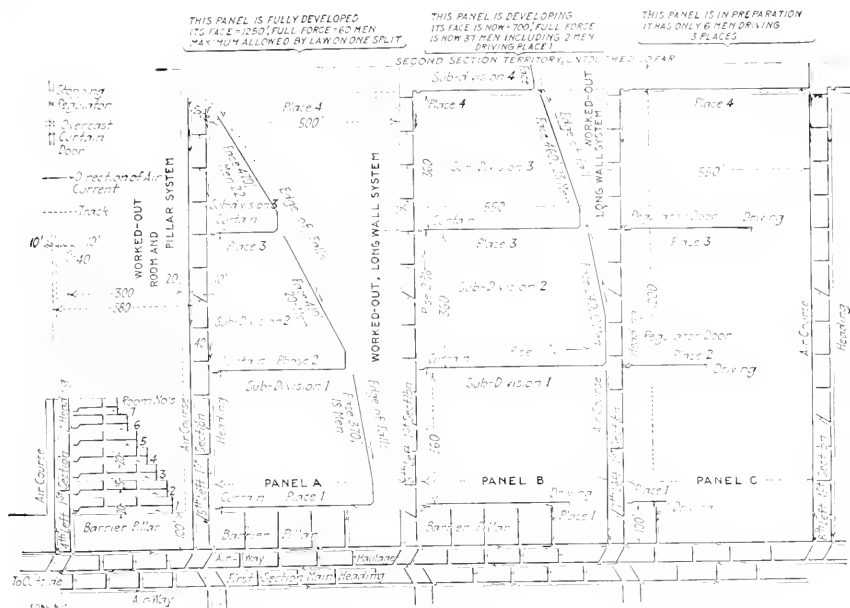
A PROPOSED PLAN OF LONGWALL WORKED ON THE PANEL SYSTEM AND STARTED FROM ROOM-AND-PILLAR WORKINGS
